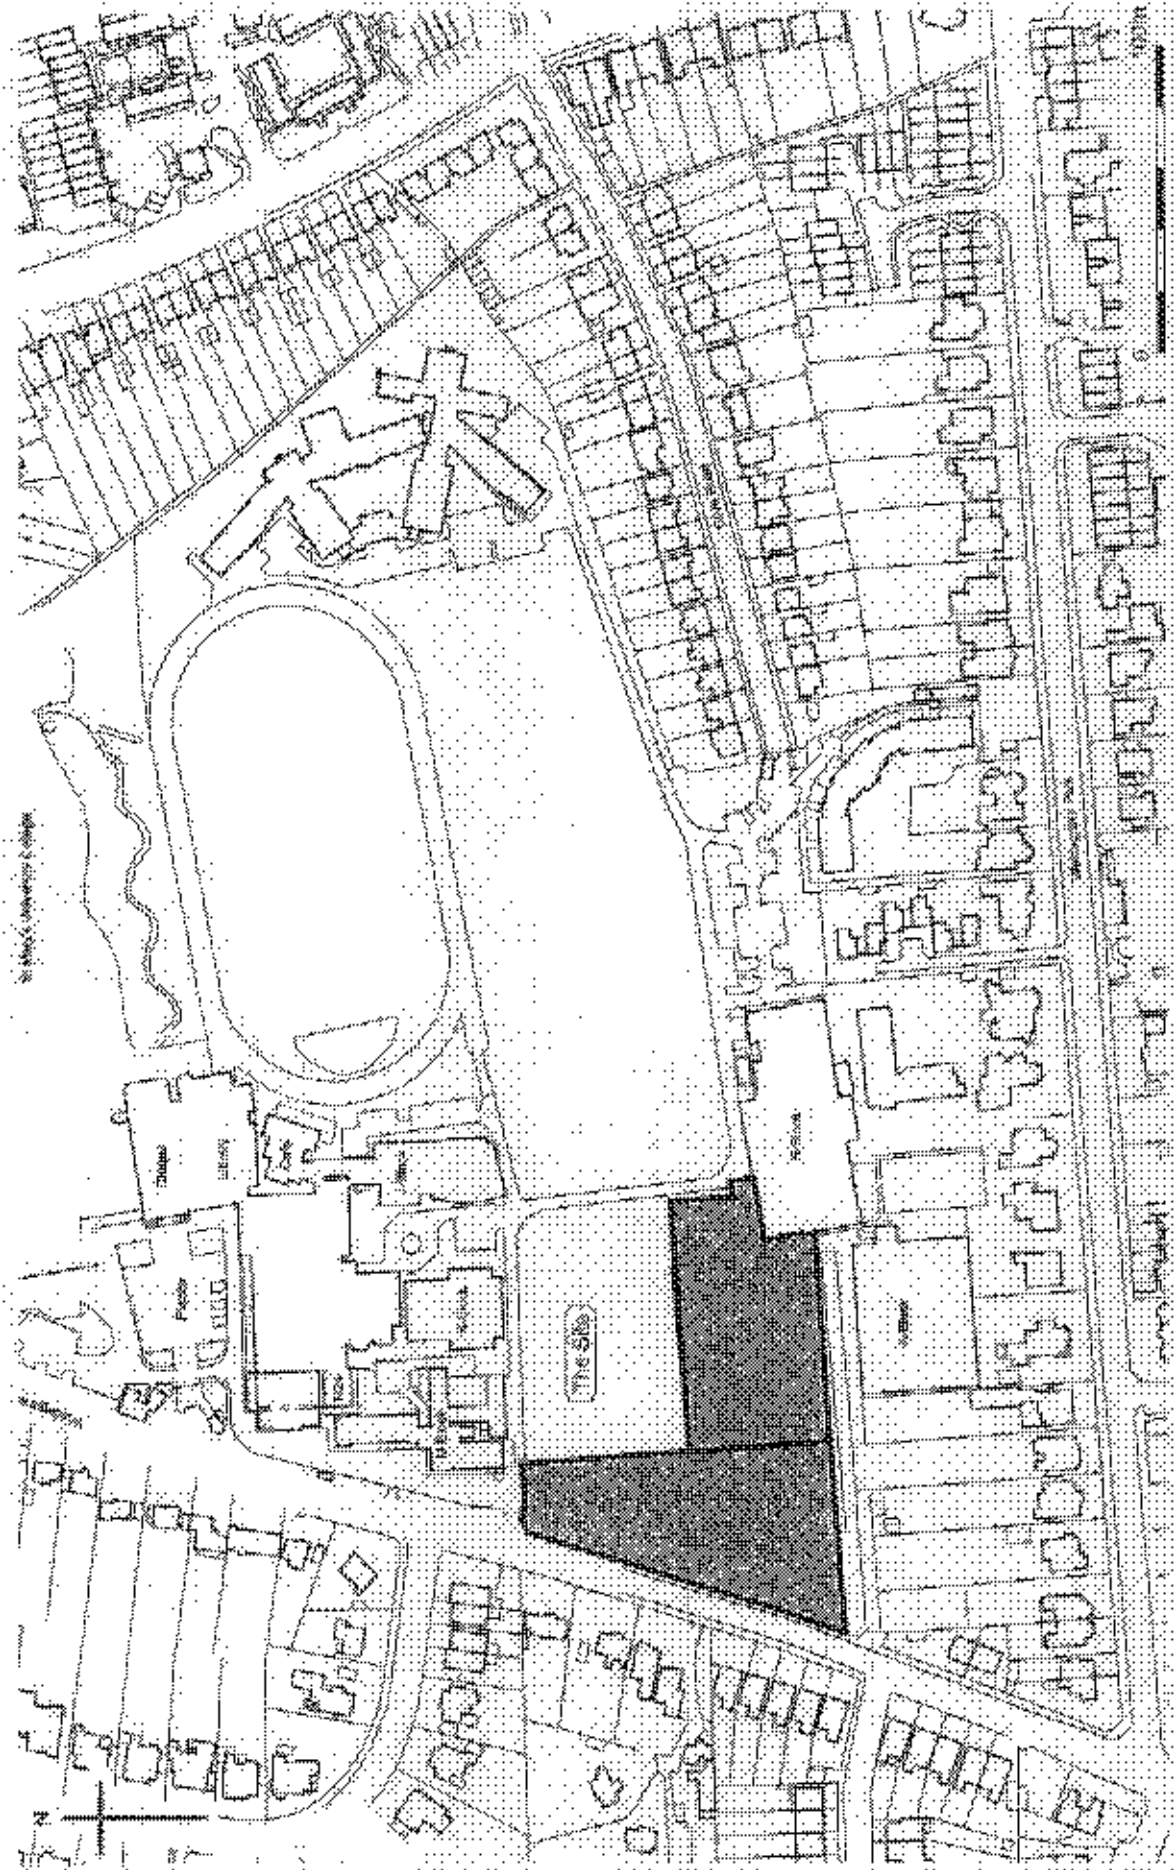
St Mary's College site plan showing existing Block B (adapted from Kittington Street Studio Architecture Gwg no. 05/01, November 06)
